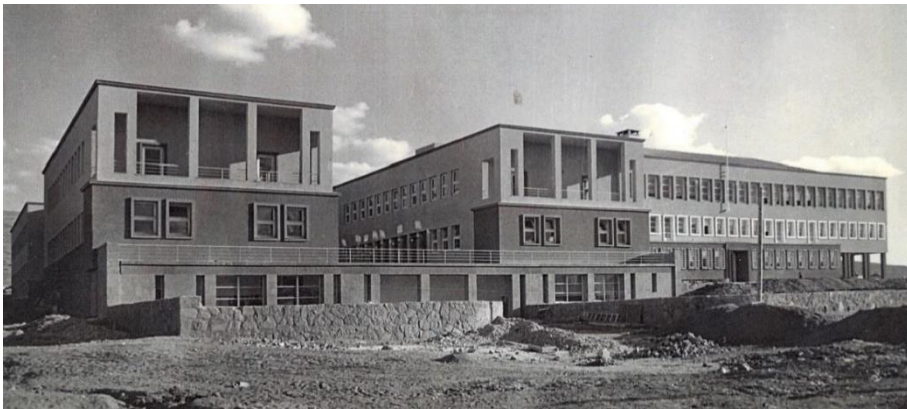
North façade of the building (facing the Street) (ALPAGUT: 2010, 145)
